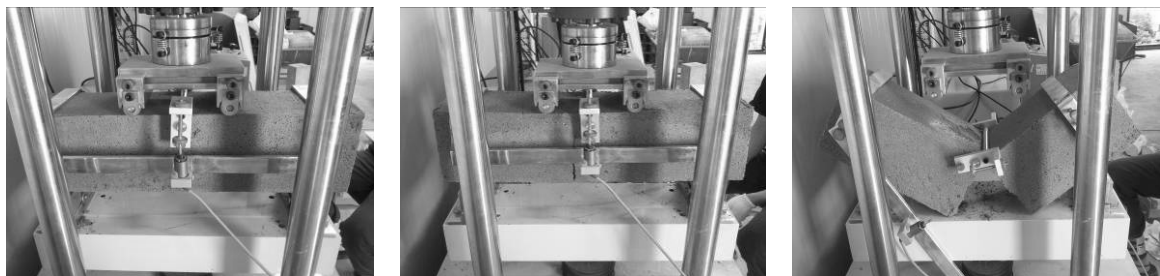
Specimen images during testing (start loading, crack initiation, failure)
